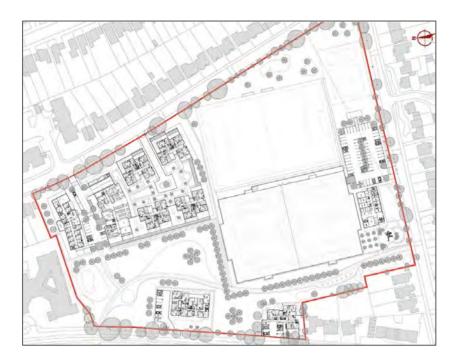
The Proposed Development Site Plan (Quantum Group Proposed Site Plan- Ref. 900-SK02)
